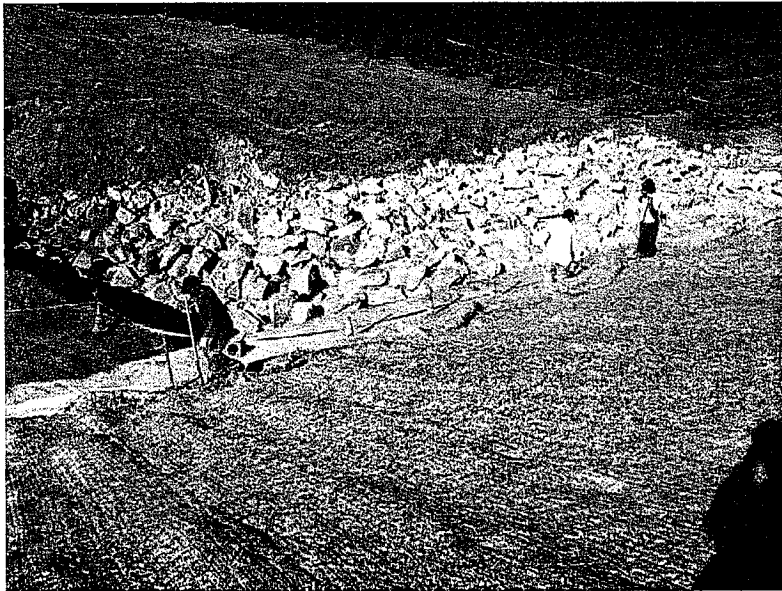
Same bridge as photo 1. Slopes have been covered with matting.
